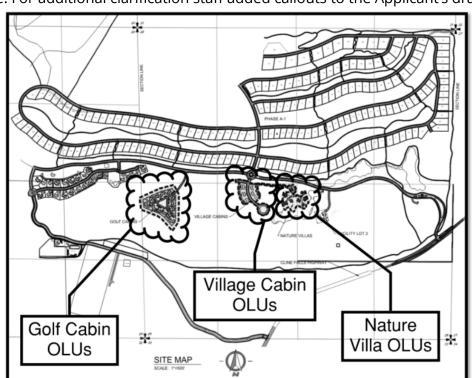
Proposed Overnight Lodging Units Site Plan<sup>Z</sup> (Note: For additional clarification staff added callouts to the Applicant's drawing)
